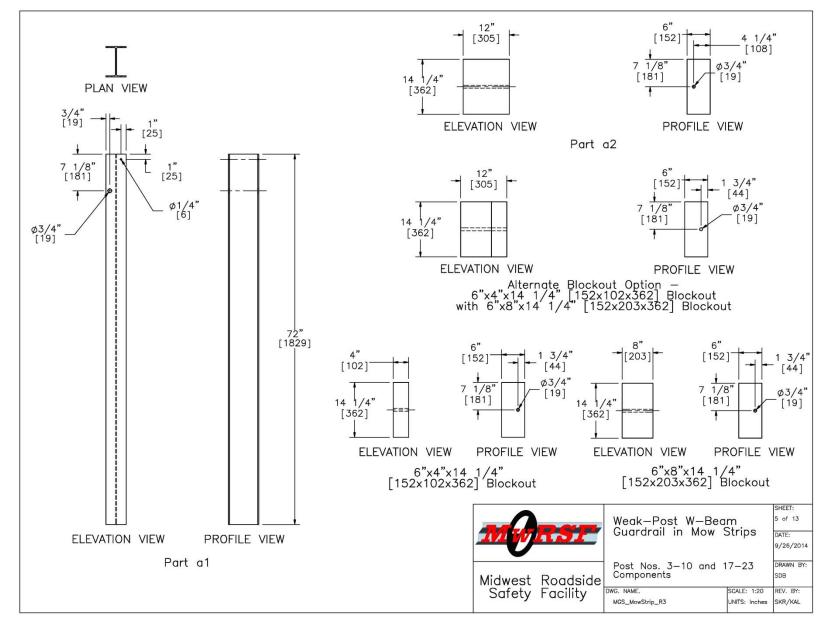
Post and Blockout Details, Test No. MGSMS-1
